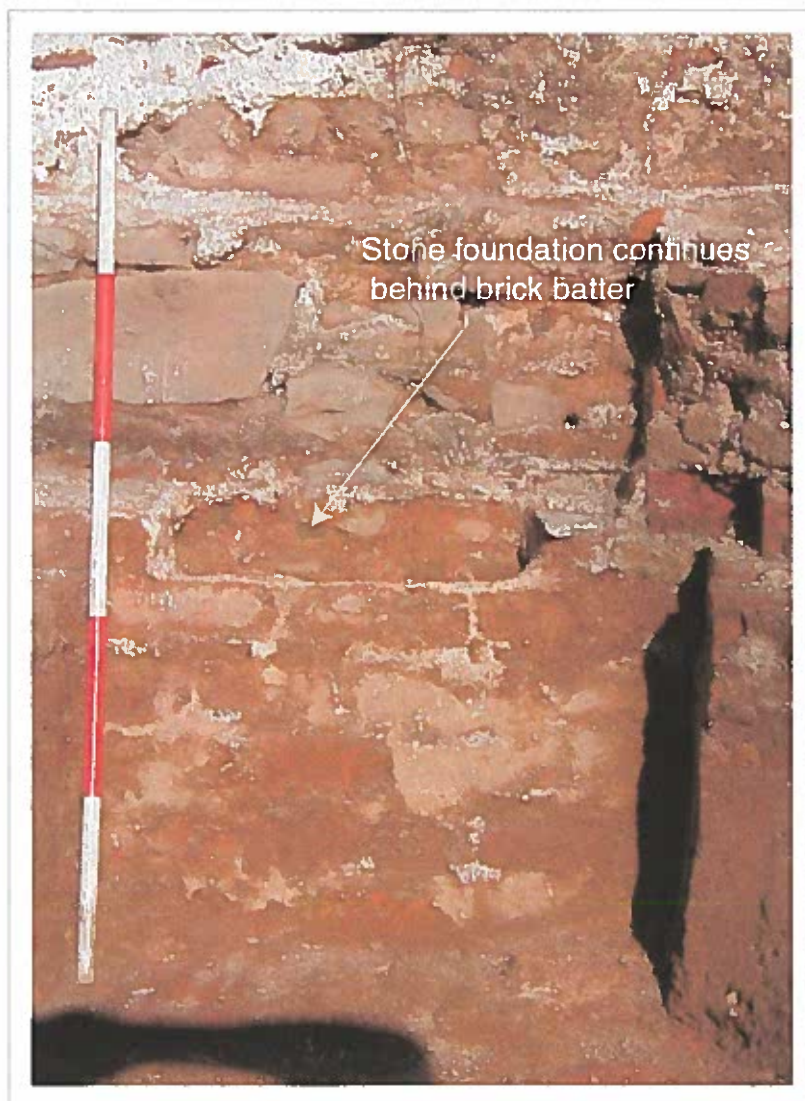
Detail of west wall foundations of Glass House, showing brick batter on stone foundations.
